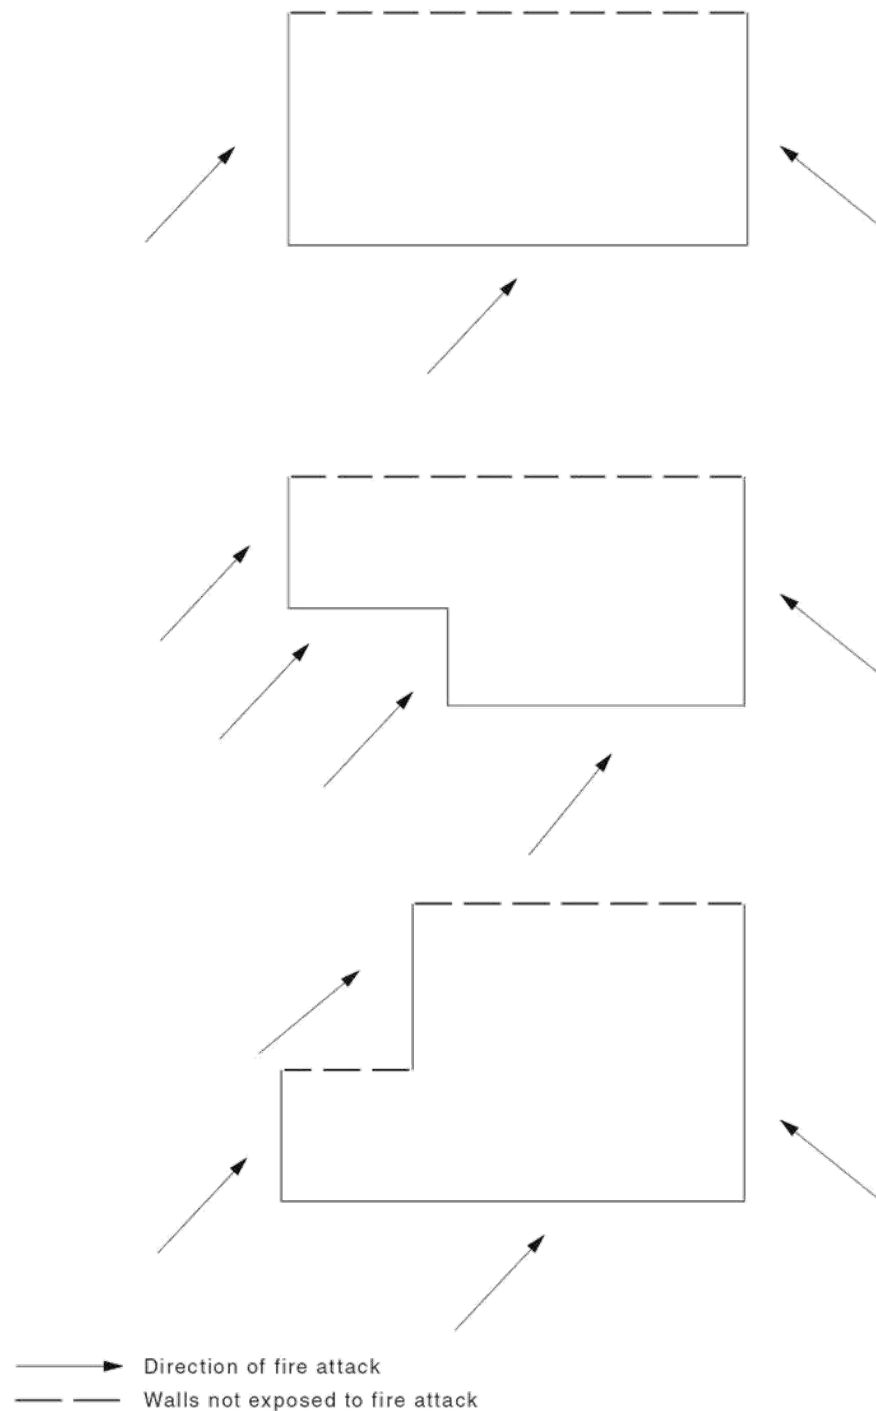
EXAMPLES OF WALLS SUBJECT TO SHIELDING
